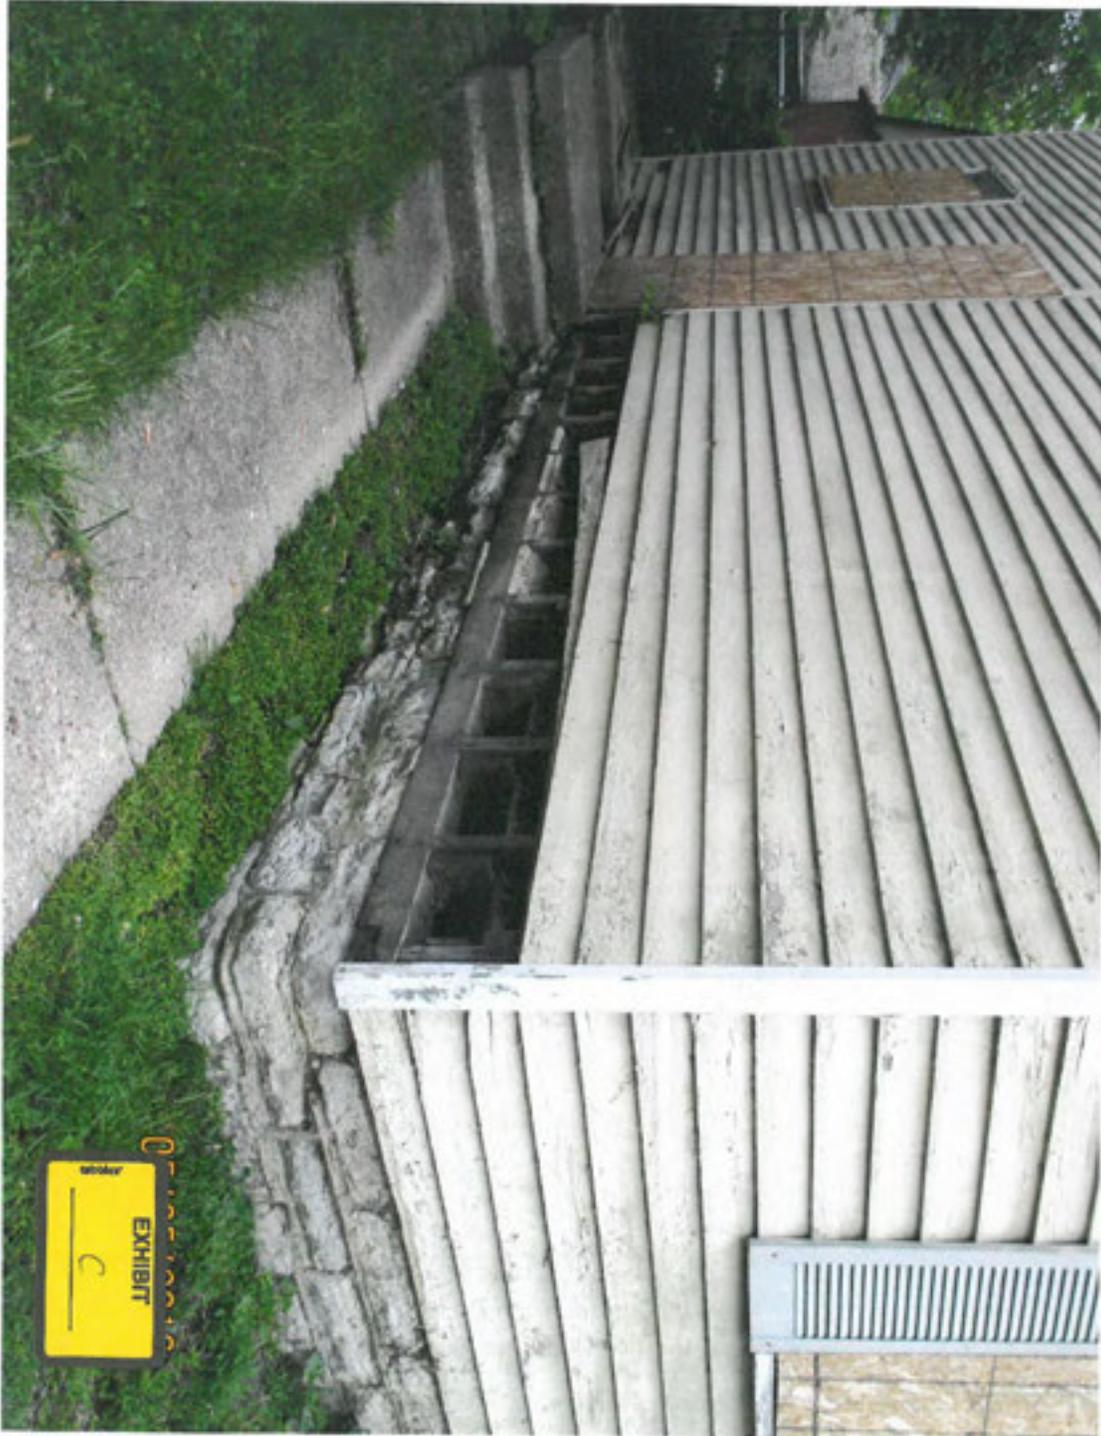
EXHIBIT D: Exterior Photo depicting siding damage
